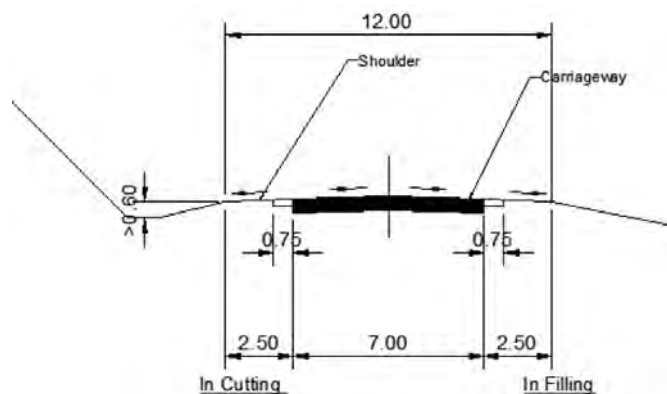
Typical Cross Section of Class II Road in Nepal Road Standard 2070 B.S (July, 2013 A.D.)
